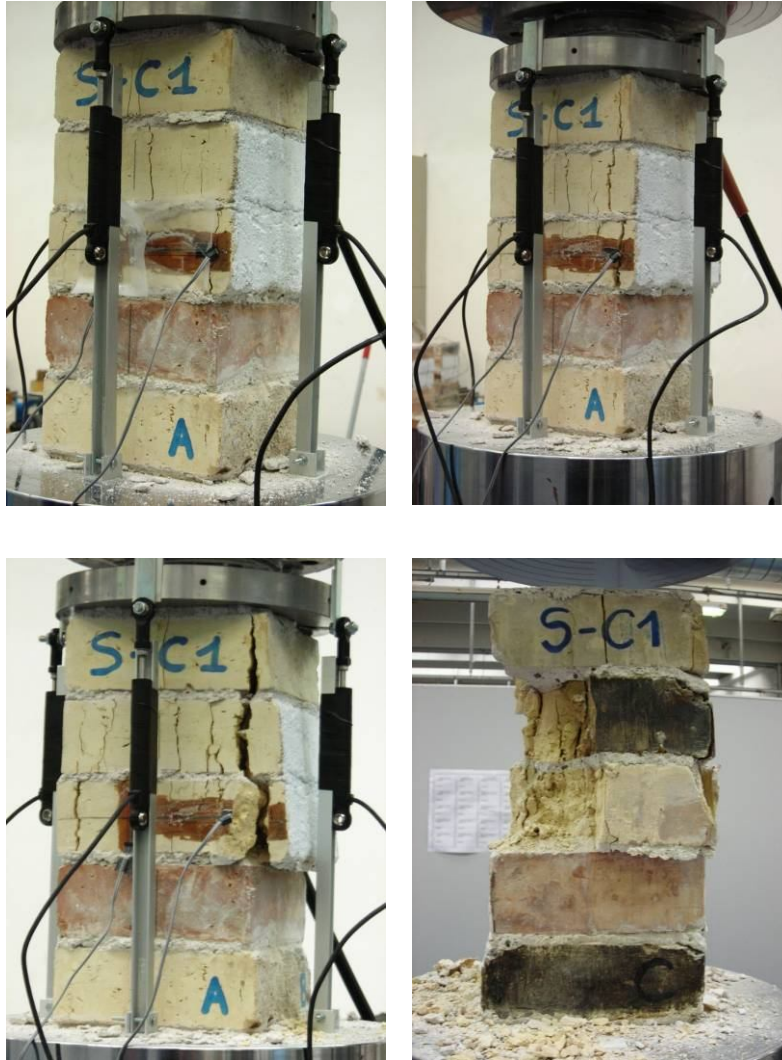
Failure pattern of historic brick masonry under centered compression: S-C specimens.
